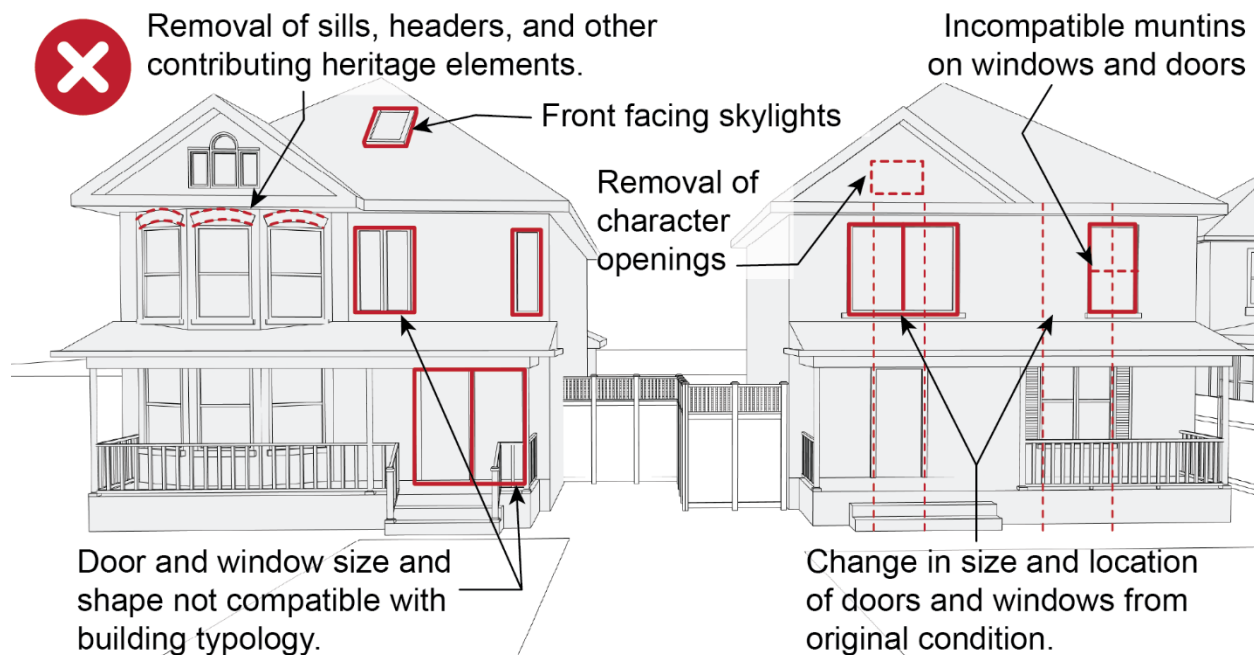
Graphic showing incompatible alterations to window and door openings of contributing residential properties. This includes the removal of architectural elements as well as altering the size and location of original openings.
